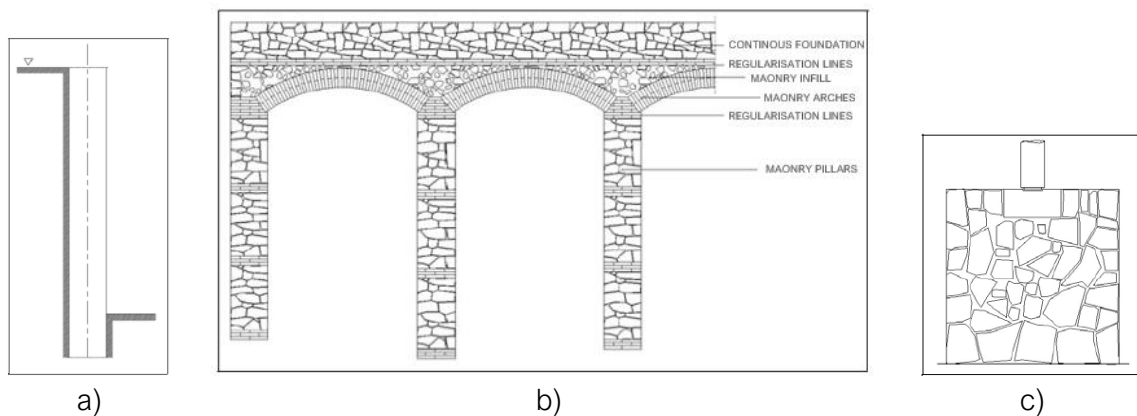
Foundation types of the existing masonry buildings in Eixample district: a) continuous foundation under load-bearing masonry walls; b) foundation composed of masonry wells and brick arches under continuous masonry walls; c) isolated footing under concrete, masonry or cast-iron pillars (Paricio Casademunt, 2001).
